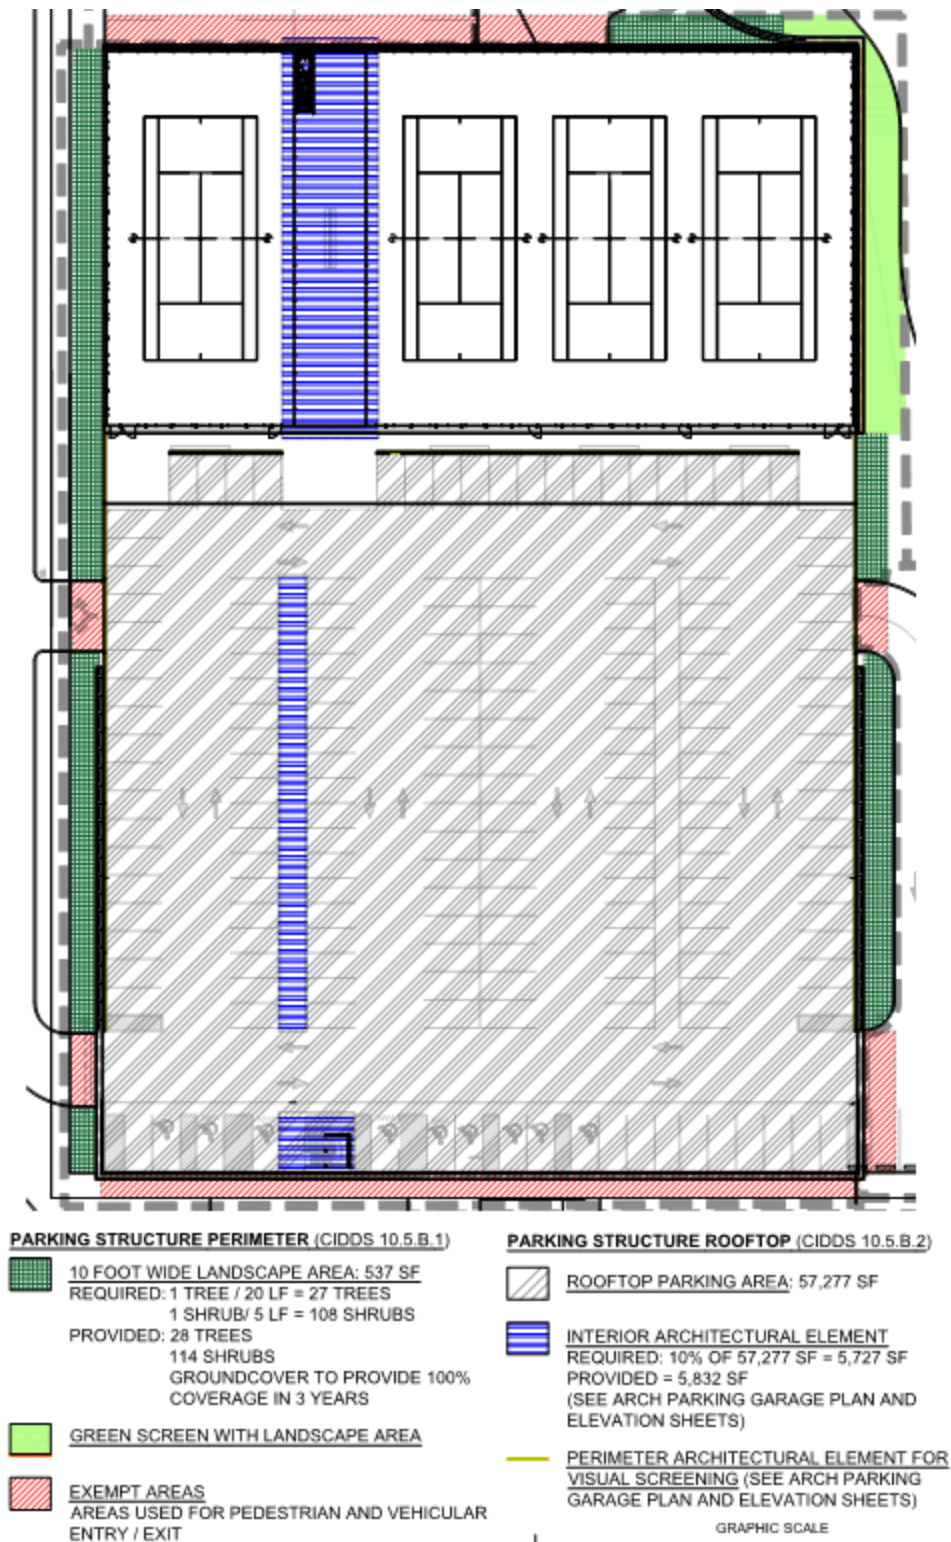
Parking Structure Code Compliance Diagram. Source: ISD (Attachment 99, Sheet L2.5LU – Landscape Plans).
